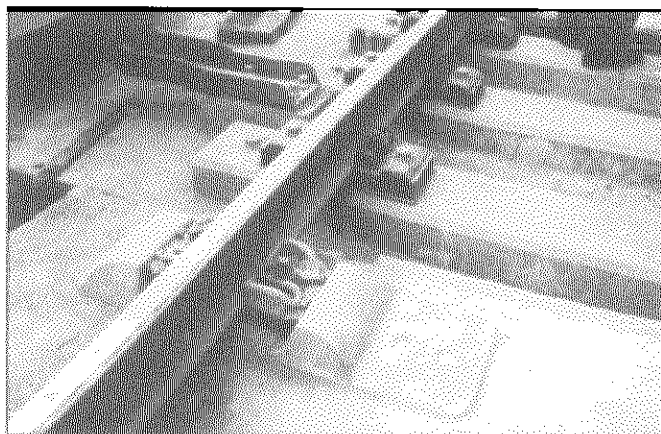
Embedded concrete sleepers (transition between two prefabricated slab structures)
